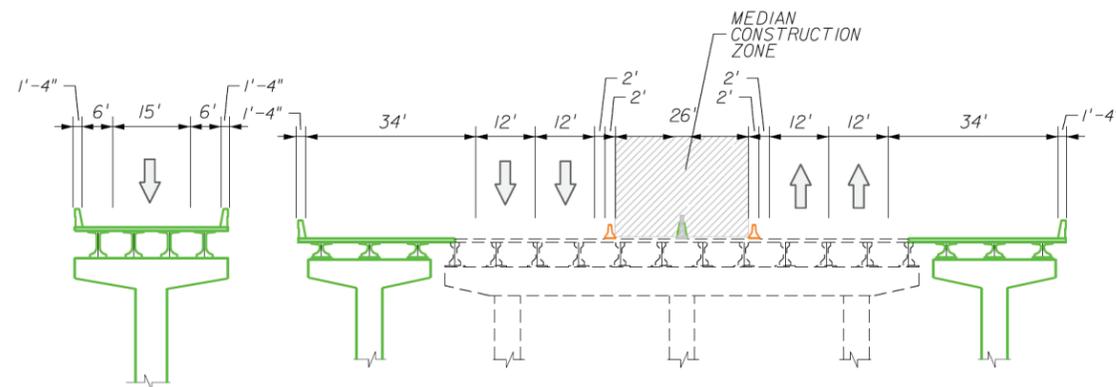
Bridge Over SW 88<sup>th</sup> Street/Kendall Drive - Median Reconstruction
